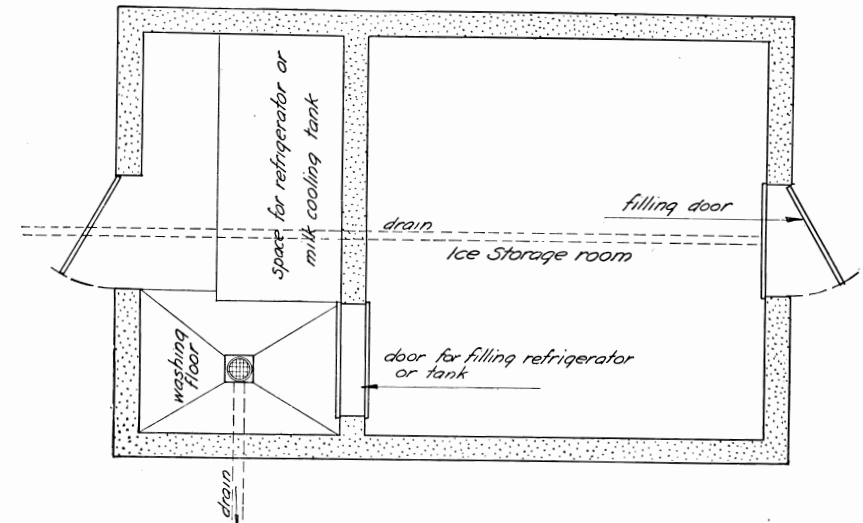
PLAN OF COMBINATION ICE STORAGE ROOM AND MILK OR REFRIGERATOR ROOM
